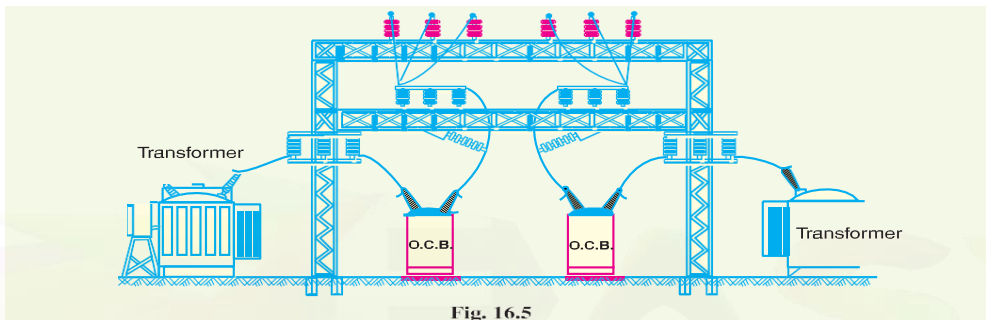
shows a typical outdoor sub-station with switchgear equipment. The circuit breakers, isolators, transformers and bus-bars occupy considerable space on account of large electrical clearance associated with high voltages.
